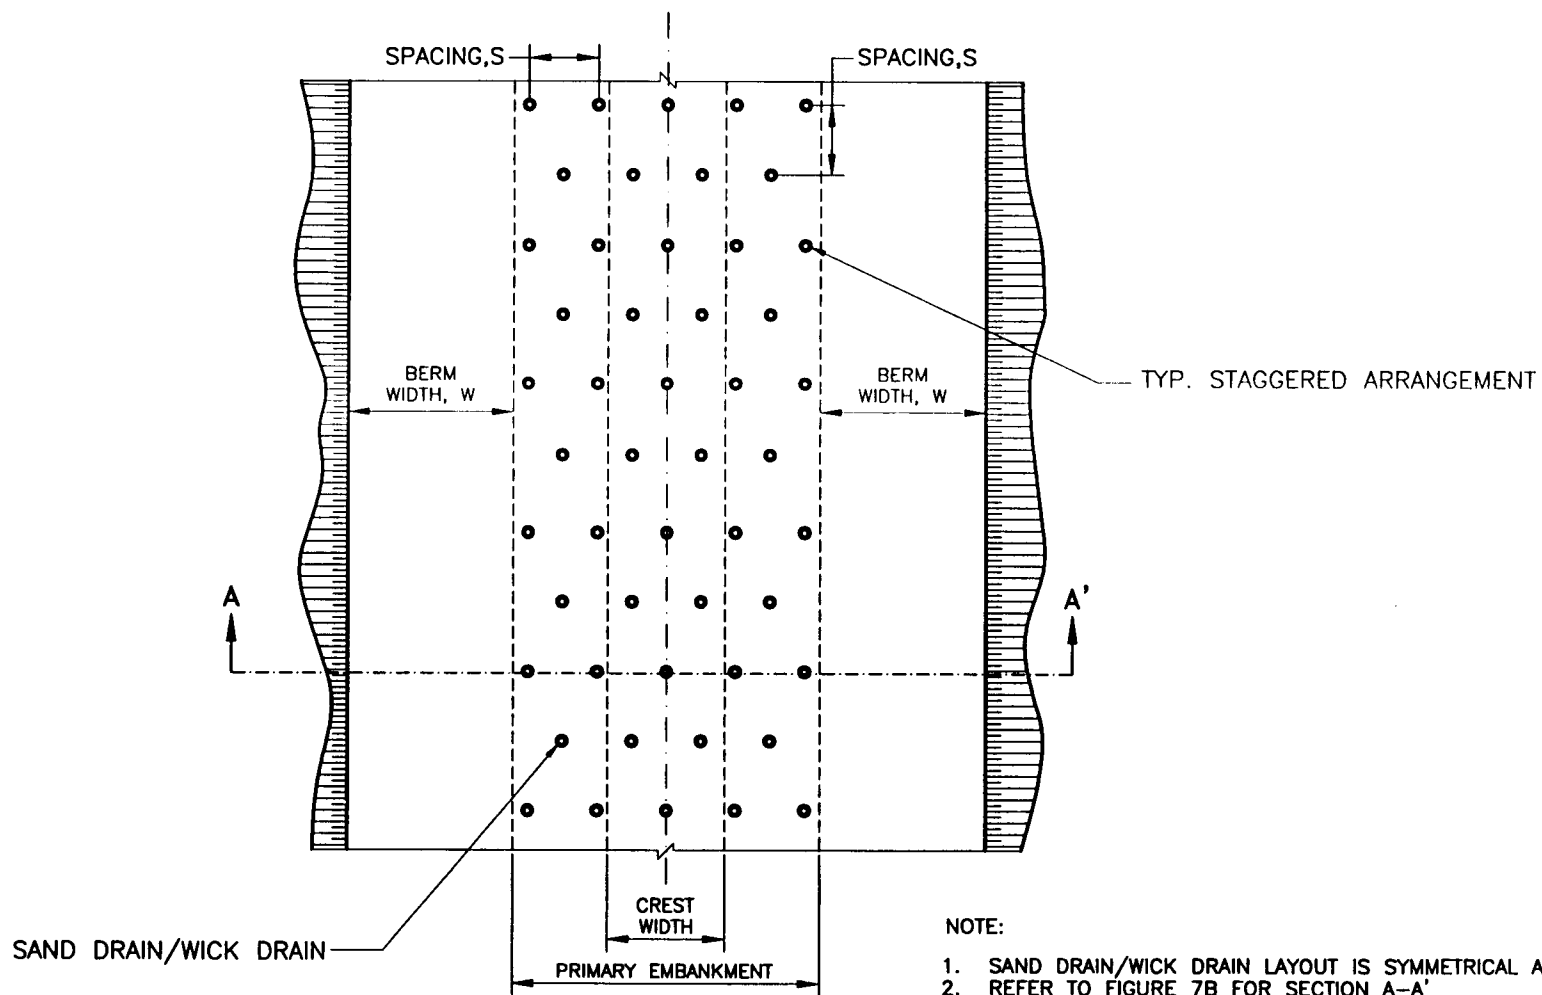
A: SAND DRAIN/WICK DRAIN LAYOUT. HIGHWAY 69, 0.4km SOUTH OF MUSQUASH RIVER, NORTHERLY 8.9 km TO TOWER ROAD - PLAN VIEW
